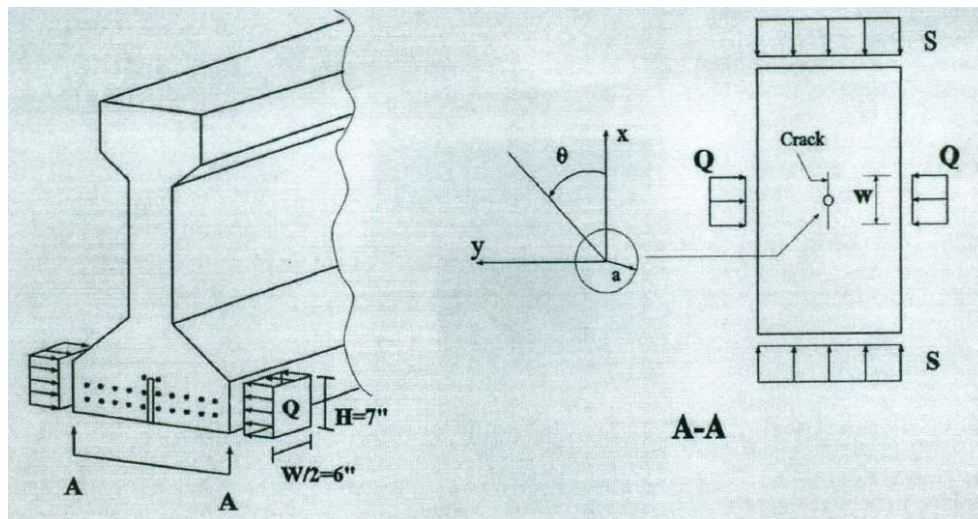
Sectional view of a prestressed concrete girder (Azizinamini et al. 1996)
